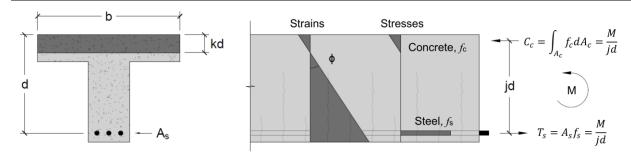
Schematic of a cracked reinforced concrete beam subjected to bending moments, showing the distribution of strains, stresses and forces
